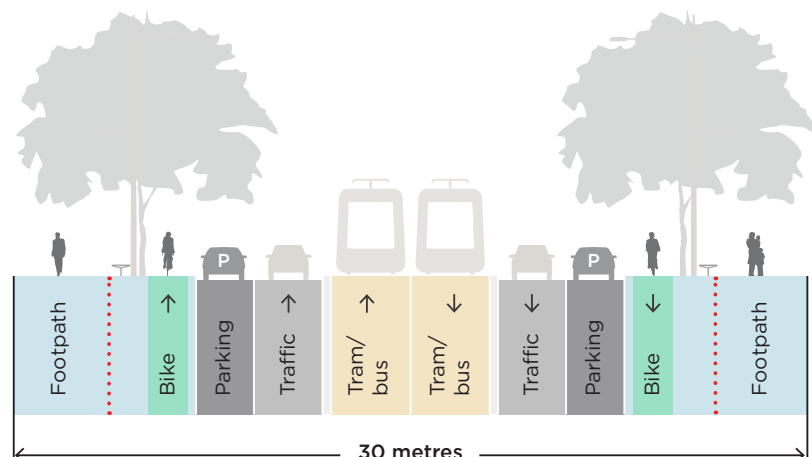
Potential typical street section for Spencer Street in the long term.
